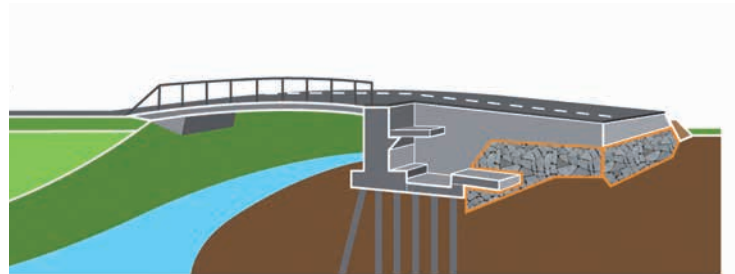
Foamed glass in use as a bulk lightener for both the embankment of a bridge's approach-ramp and the transitional structure.
